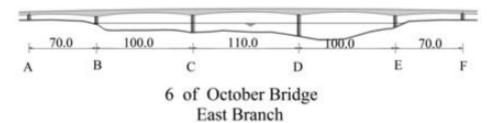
6thOctober Bridge east branch (Handbook of International Bridge Engineering, 2000)
